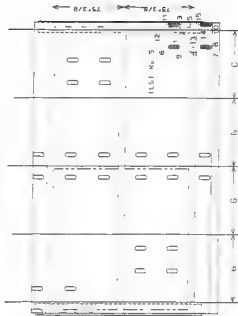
LVDT Locations (Fourth Bridge - Test No 5 - Static Test)
